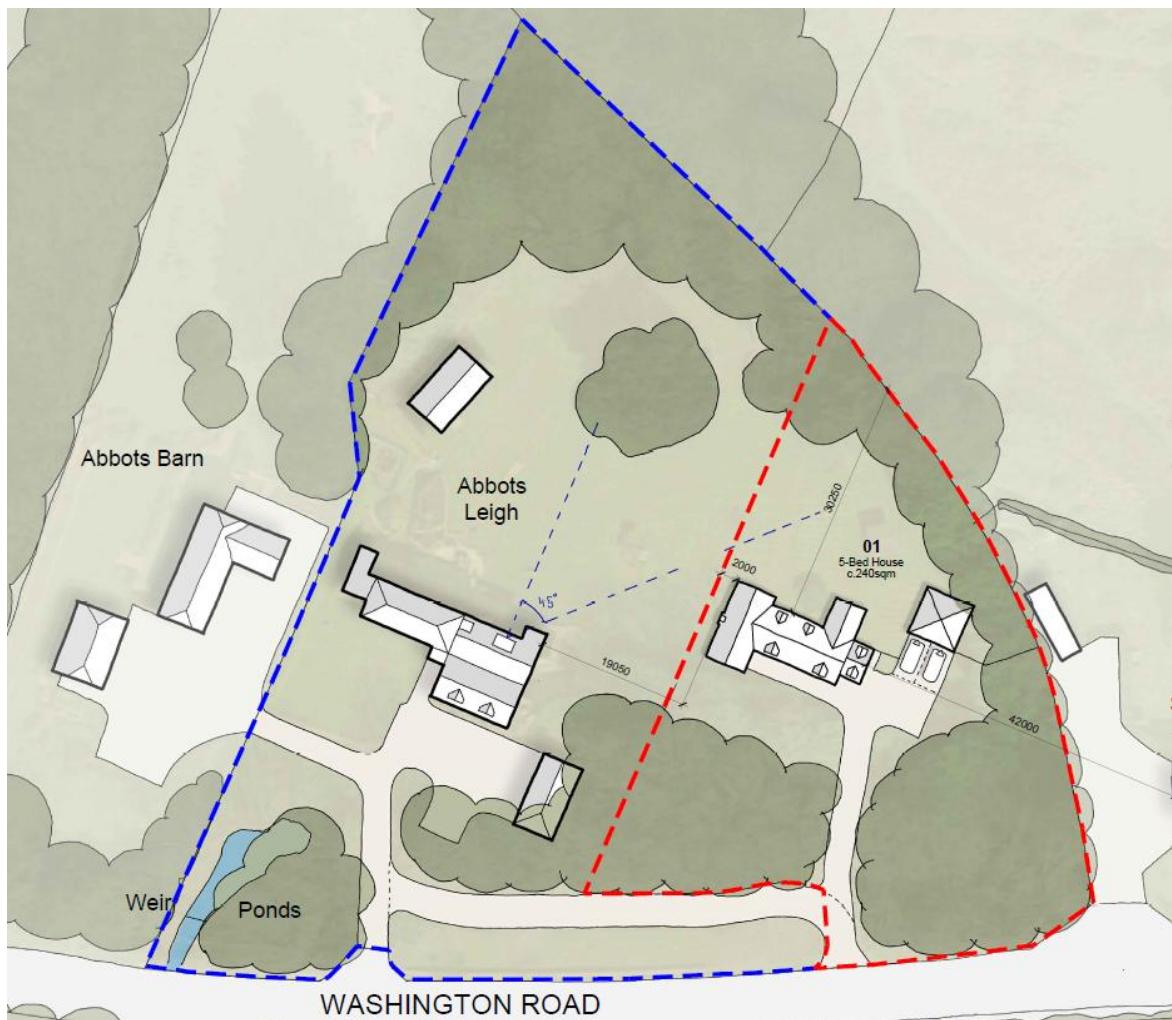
Site Plan for Pre-Application Reference PE/24/0035
